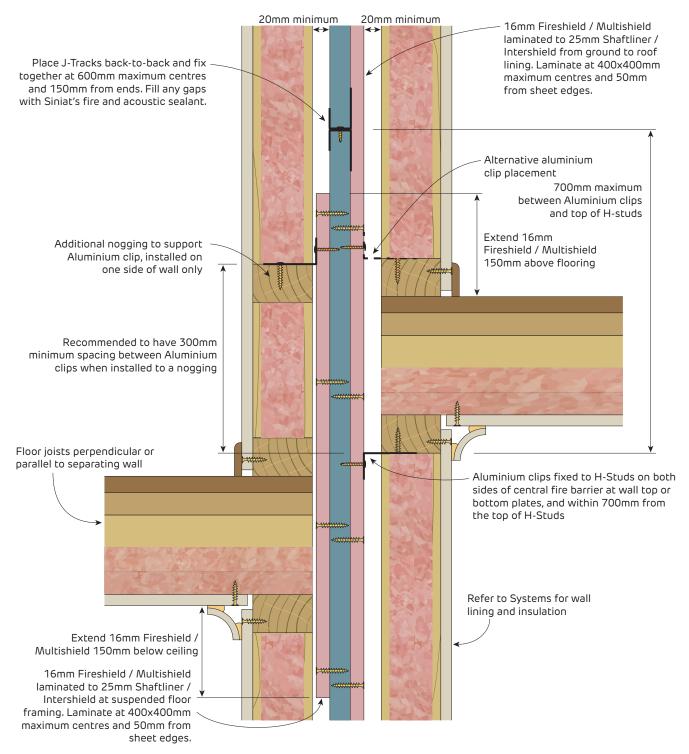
Interhome Wall to Upper Storey Staggered Floor with Additional Nogging Installed
